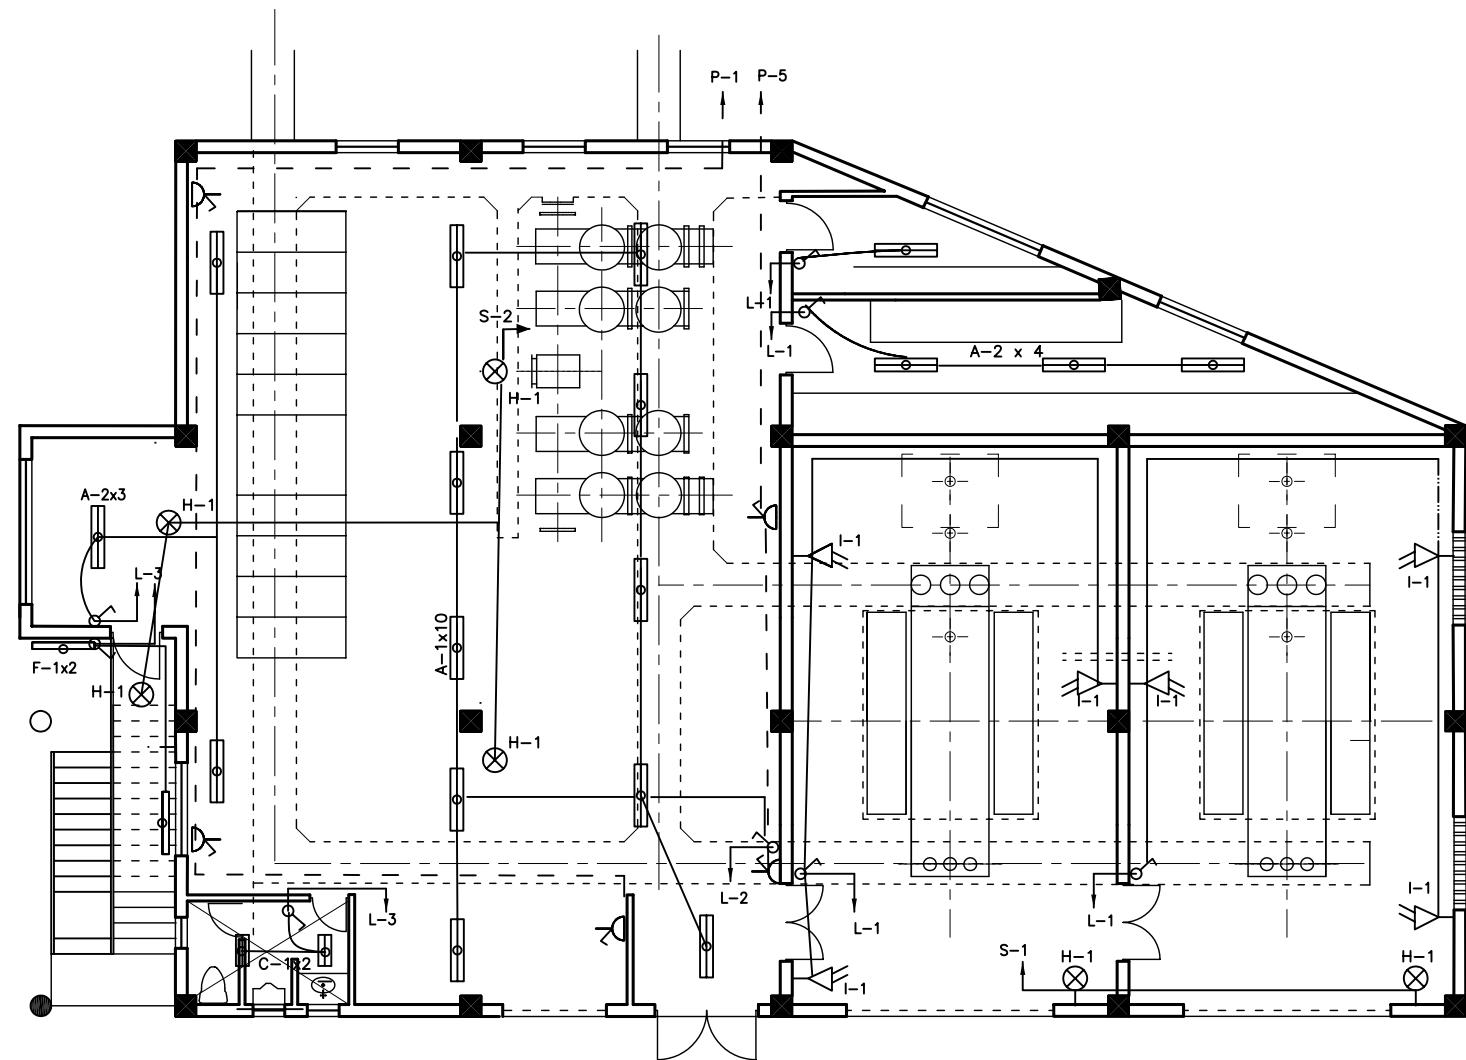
K3 S/S Arrangement of Lighting Fixture at Ground Floor
